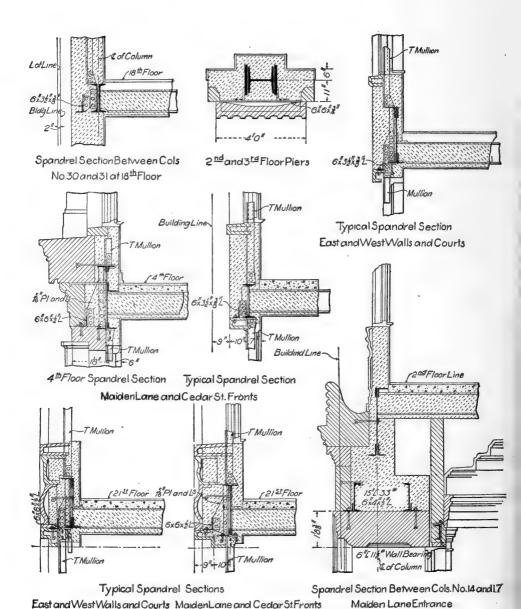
Details of Wall Construction, United Fire Company's Building, New York. (Eng. Record, Dec. 9, 1911.)
